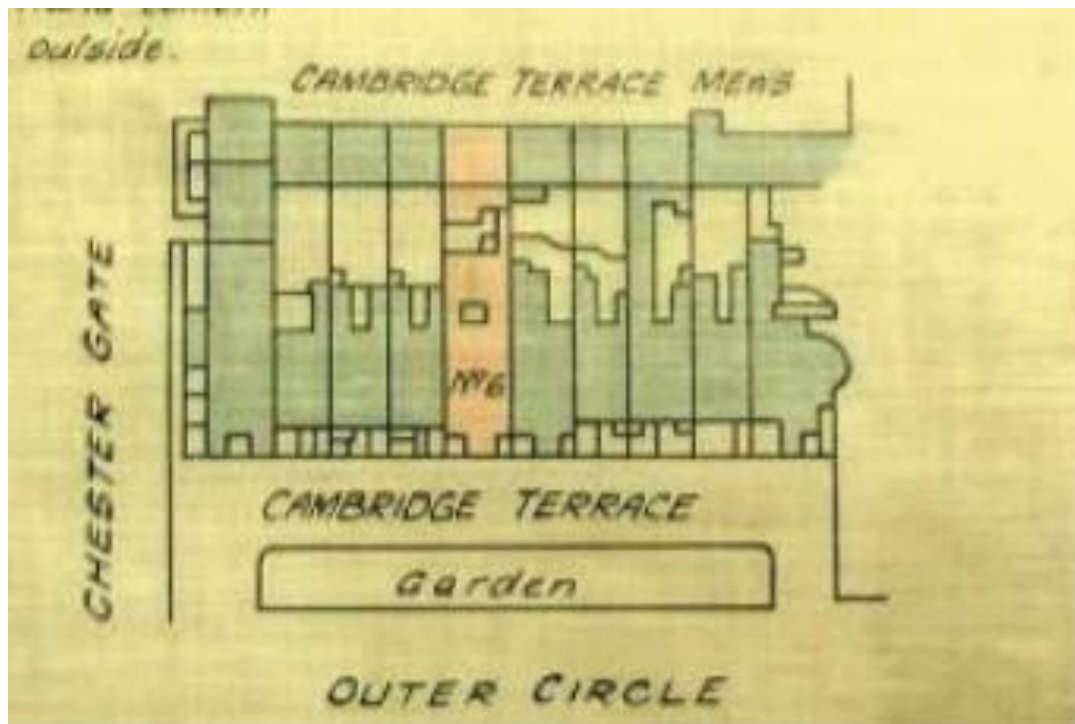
1935 Block Plan showing kitchen has been incorporated into no. 10 Cambridge Terrace
